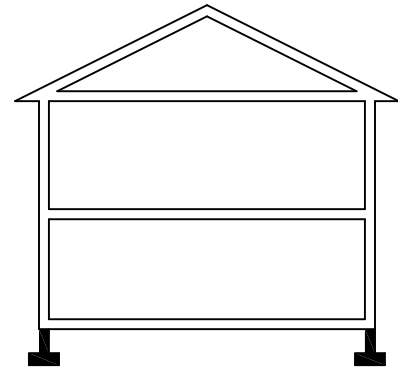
ROOF, CEILING AND TWO CLEAR-SPAN FLOORS
